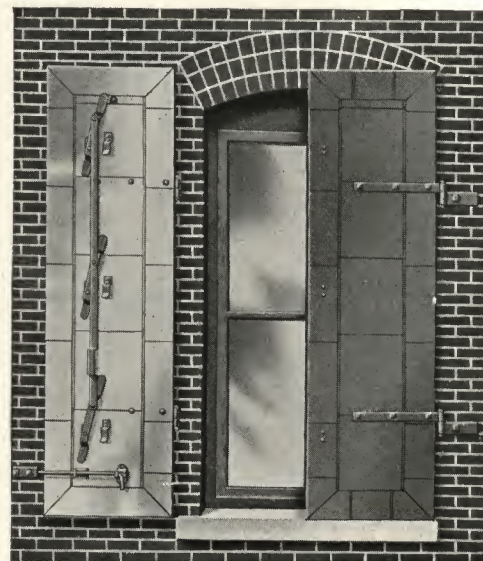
R-W No. 407 Fire Shutter Fixtures
